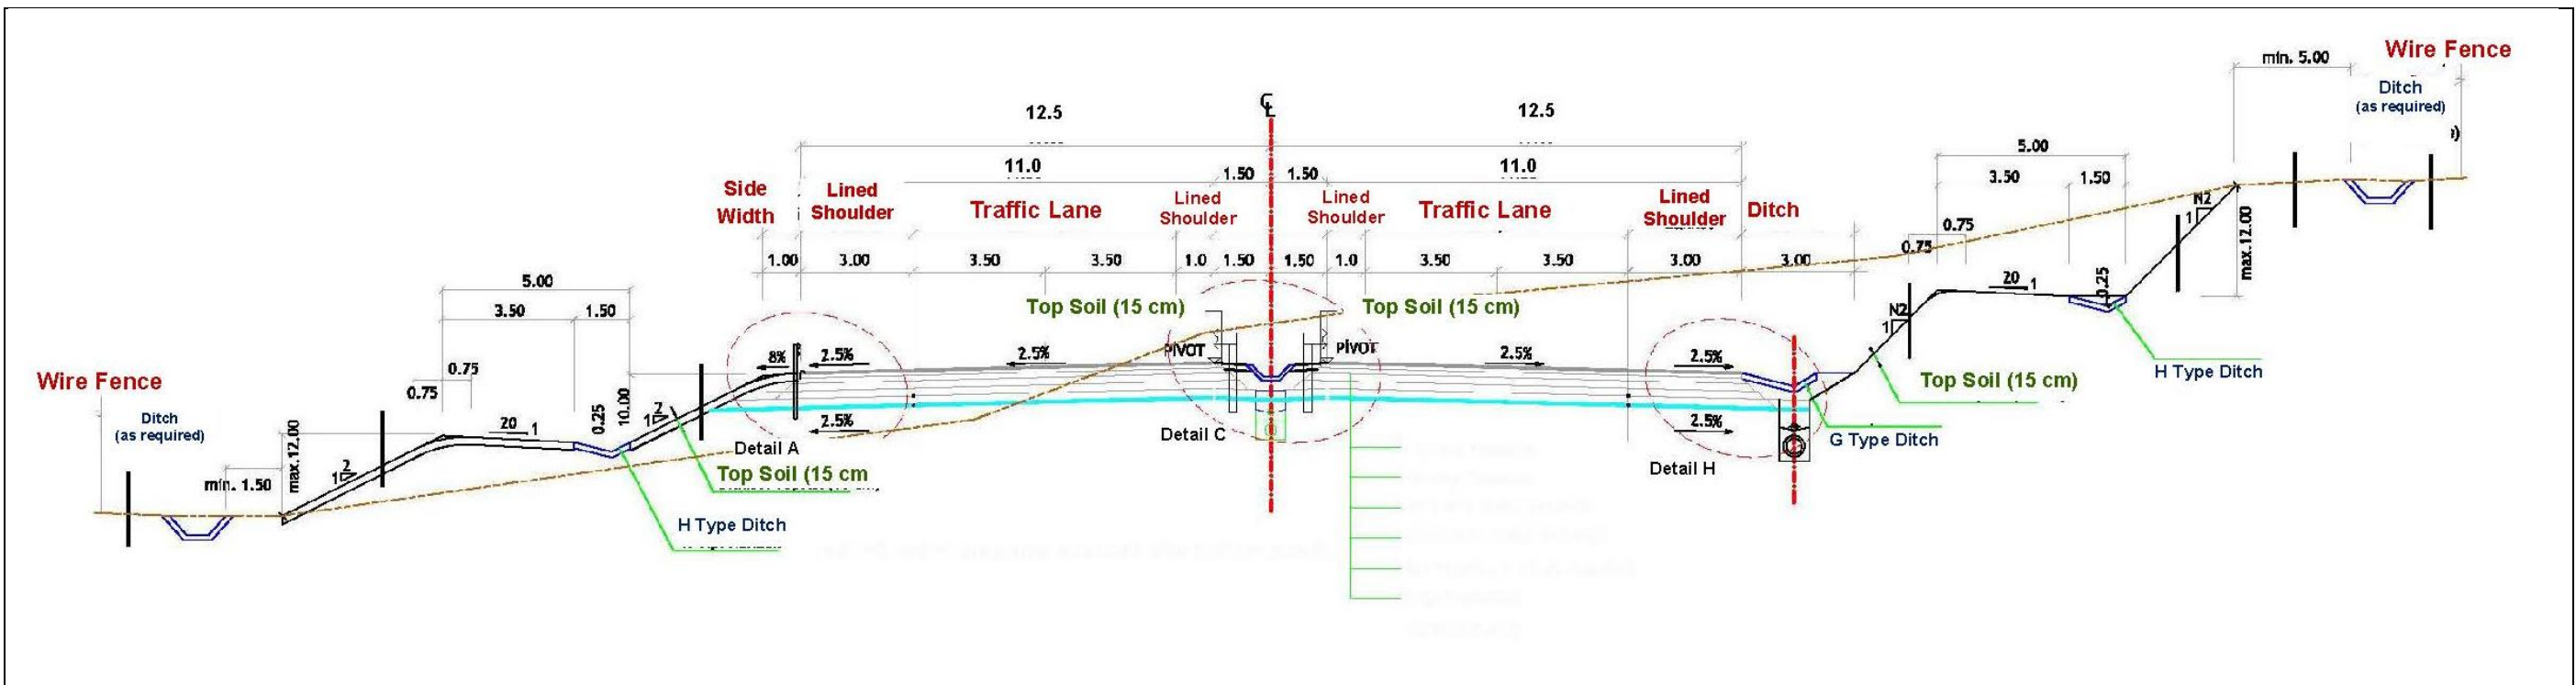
Typical Cross-section for the Motorway's Access Roads
